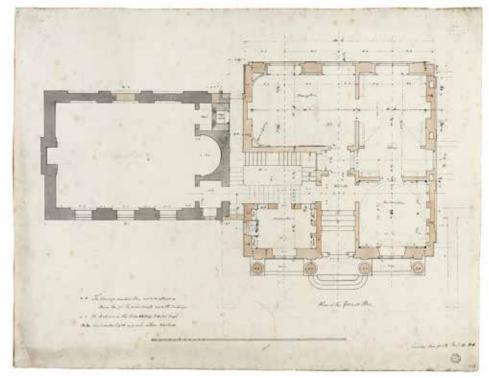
Plan of the ground floor of Pitzhanger Manor, Soane office working drawing, copy, 13 January 1801 (© Sir John Soane's Museum; photograph by Hugh Kelly)
